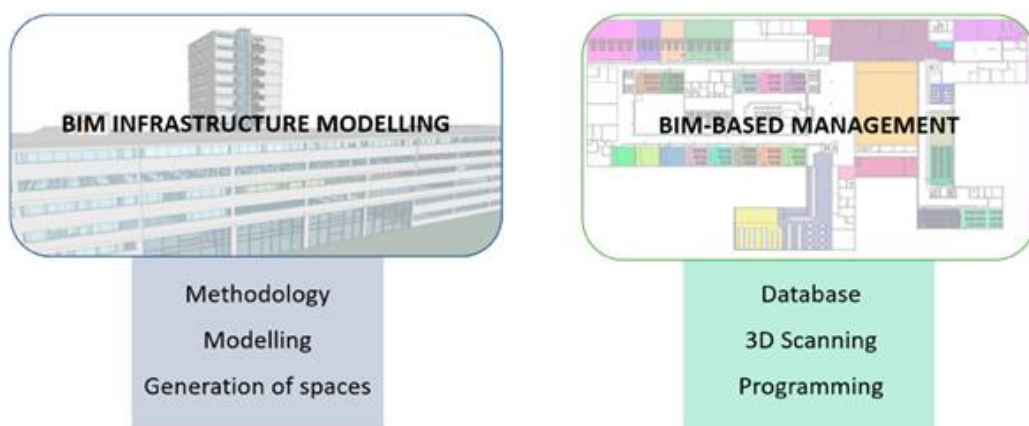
Building information (BIM)-EDU Project Building Model. Reprinted from (Pavón et al., 2020, p.7).
